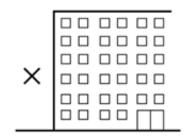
Monolithic façades 'hole in wall' must be avoided
